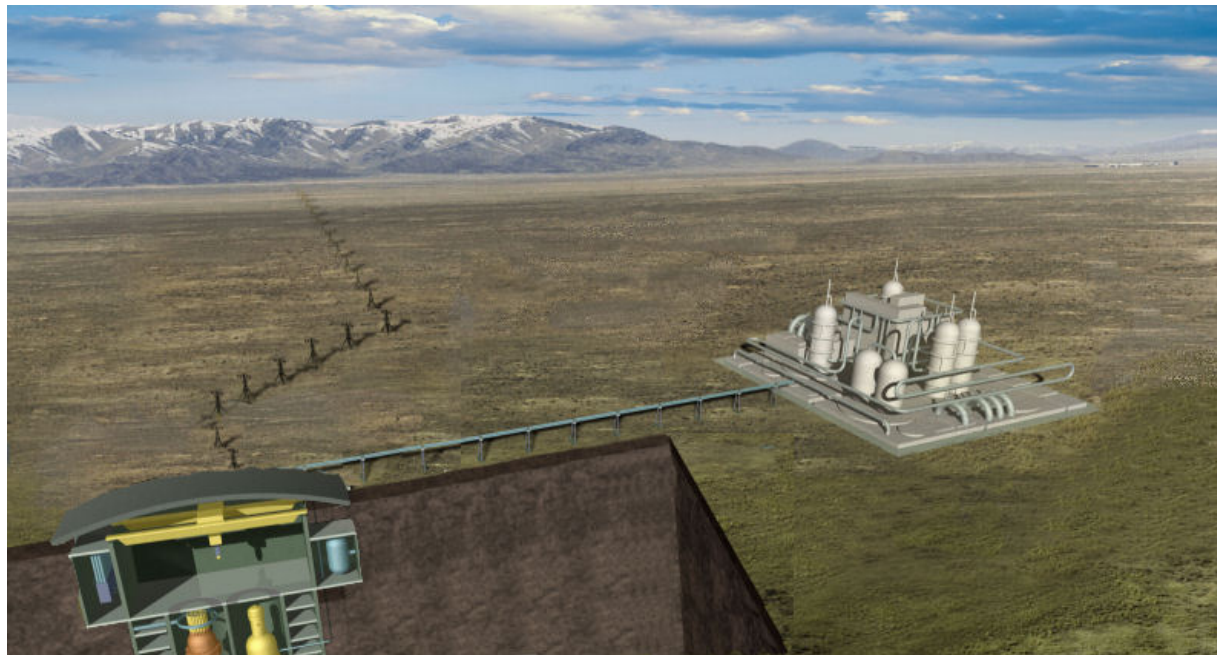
Case 3: Constructing the nuclear facility primarily underground.
